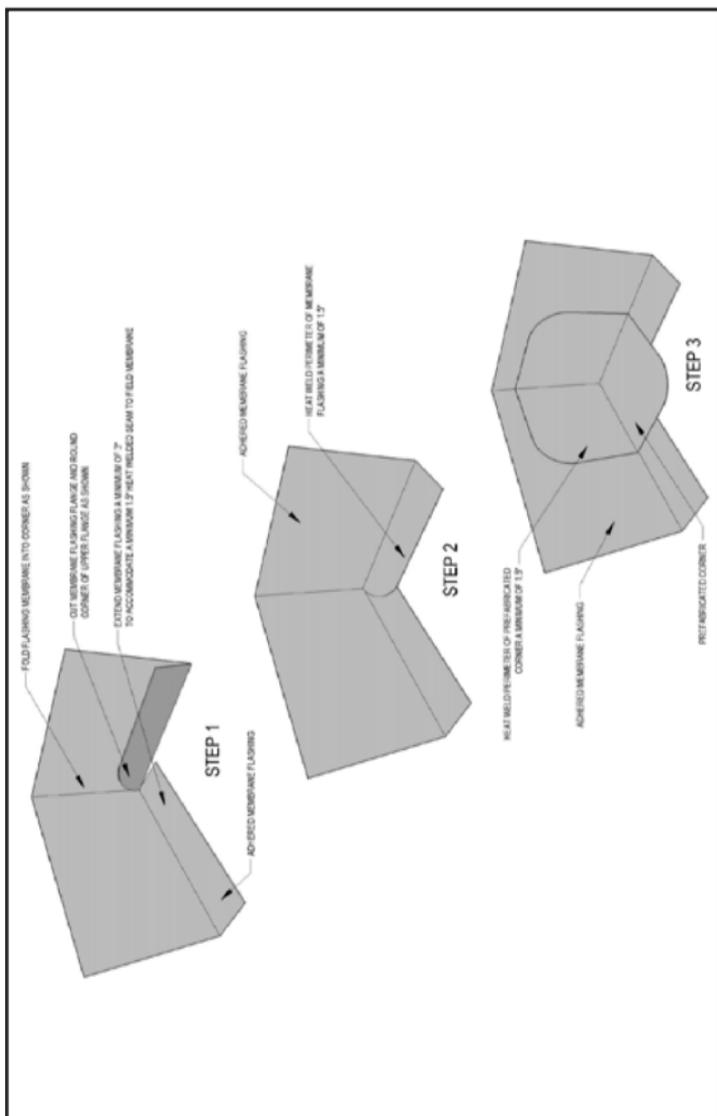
Adhered PVC Flashing Membrane At Prefabricated Inside Corner
